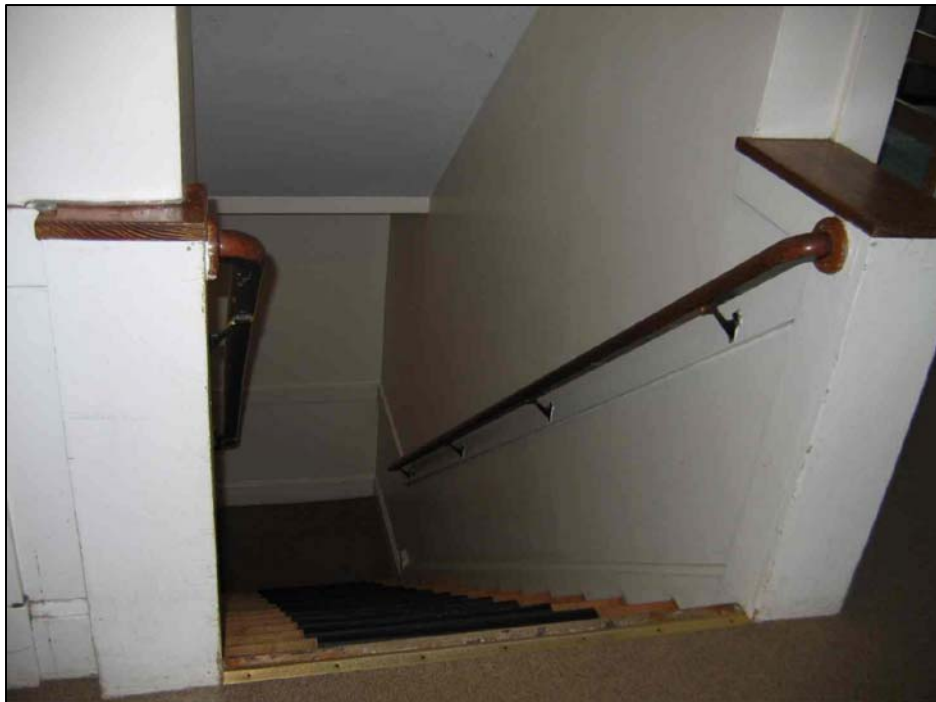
Room 201 (hall), stairway and “plaster rails.”
